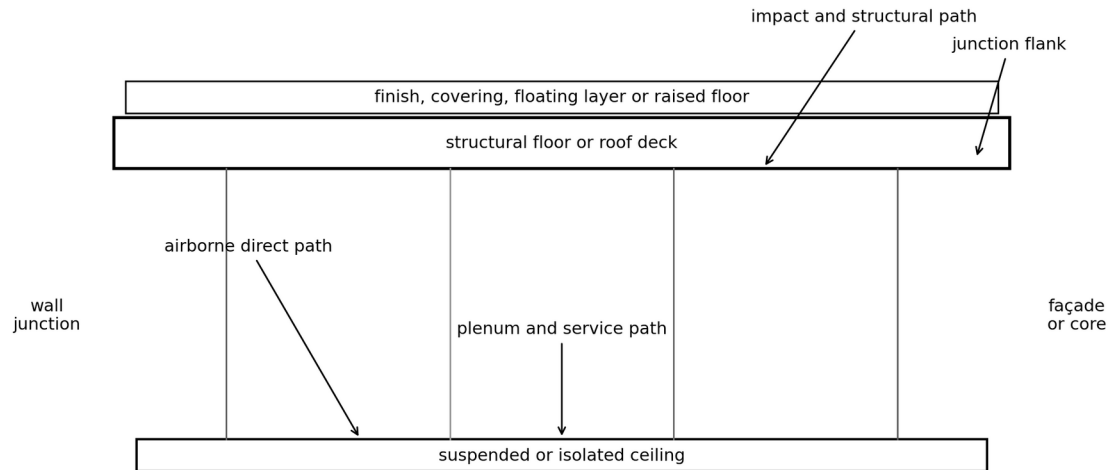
Floor-ceiling and roof systems form a network of direct airborne, impact, plenum, service and junction paths. Author's original diagram.
